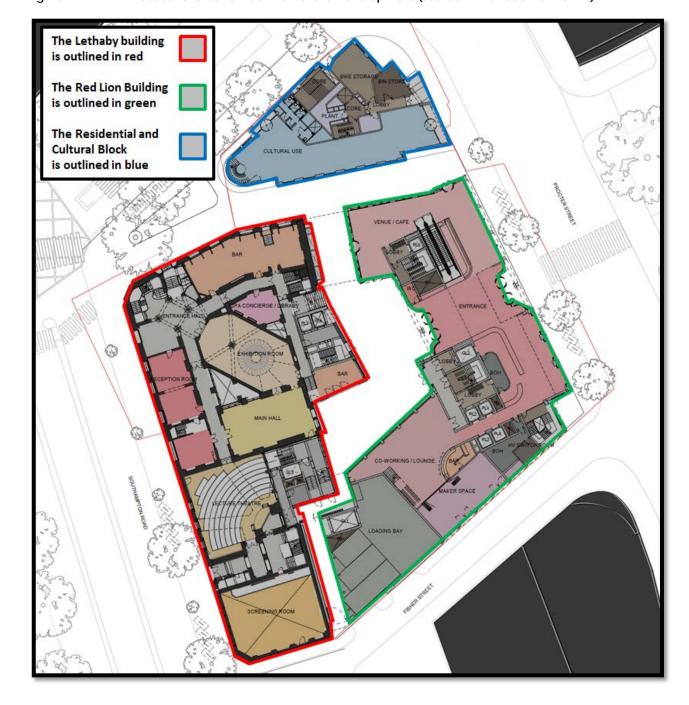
An Illustrative Ground Floor Plan of the Development (source: Amended from Orms)
